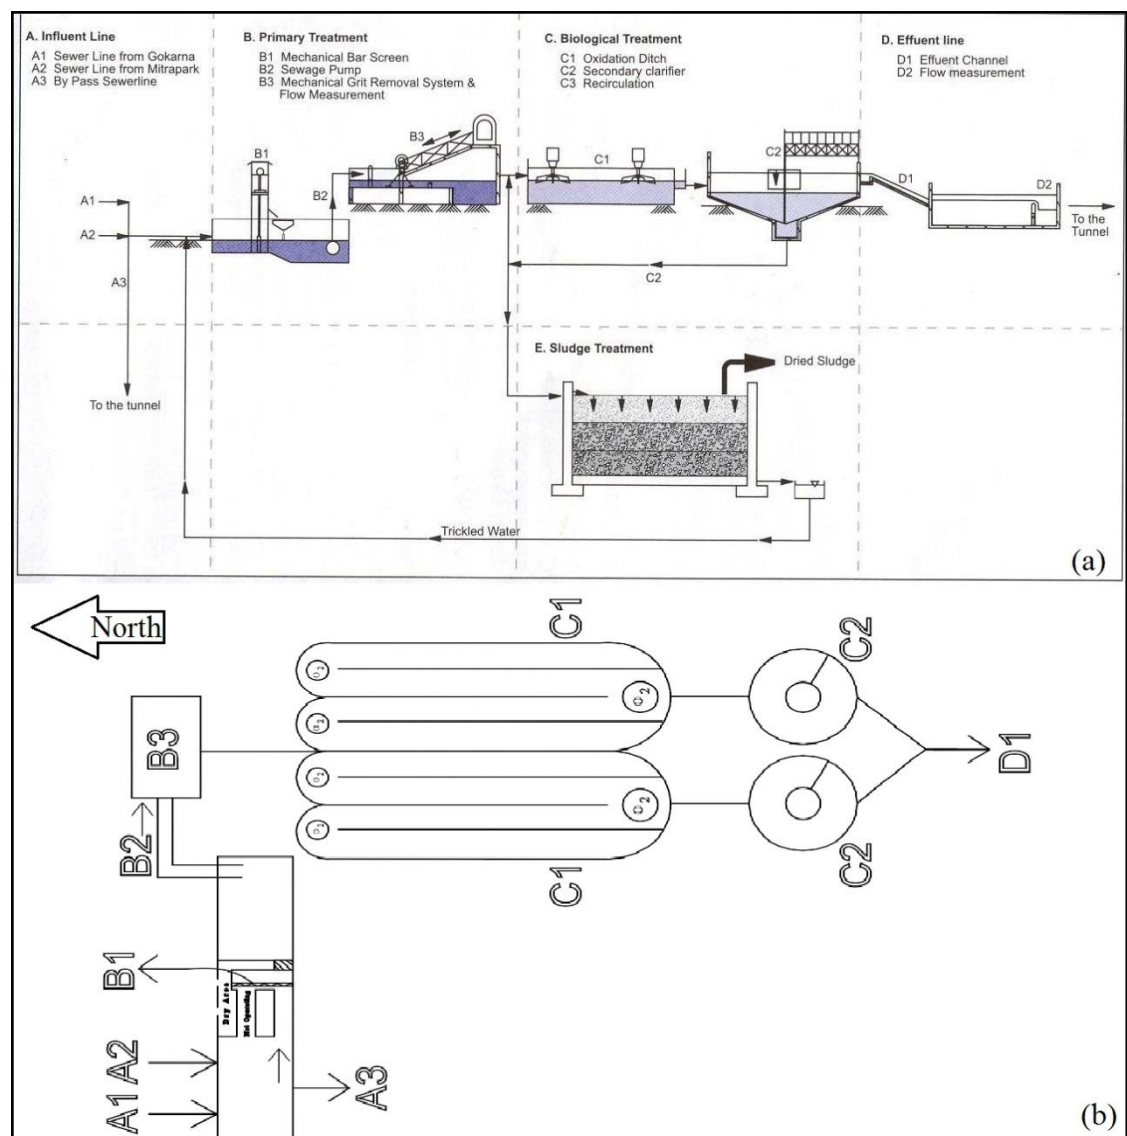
Guheshwori WWTP; (a) Cross-sectional view of plan [12]; and (b) Bird's eye view of plan
